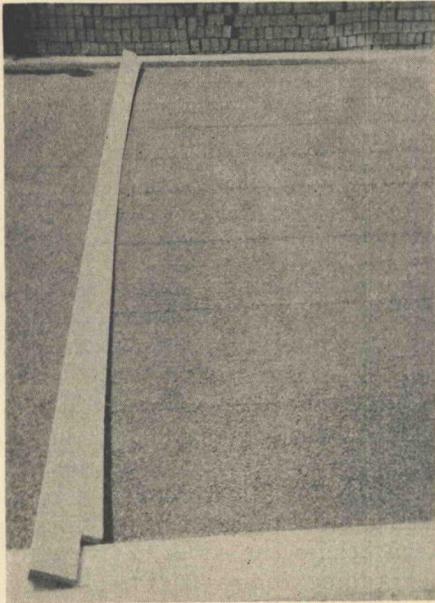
Templet Used to Score Bedding Course, Enabling the Droppers to Maintain Straight Rows of Bricks.
